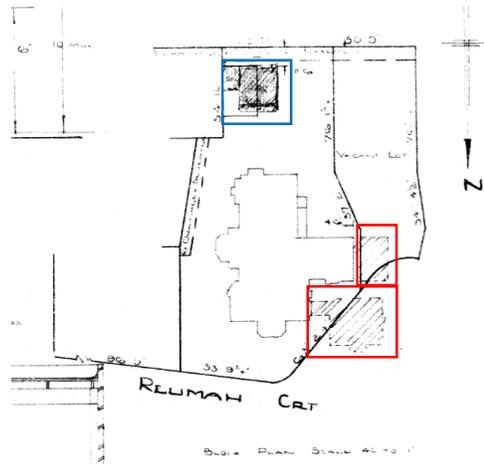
Extract from building plan showing proposed garage (in blue) and sections to be demolished (in red) (Source: BP 18378, held Boroondara City Council)
